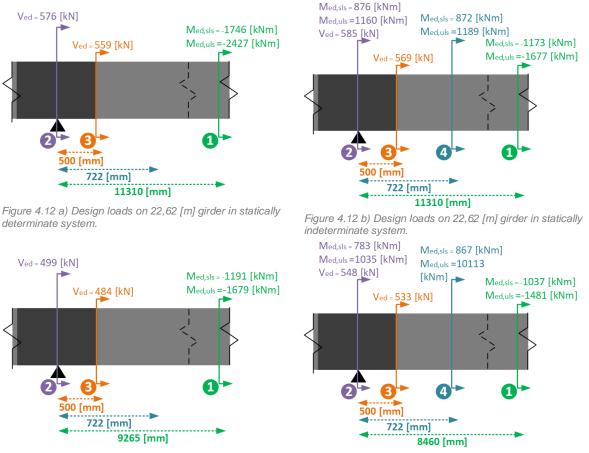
c) Design loads on 18,53 [m] girder in statically
